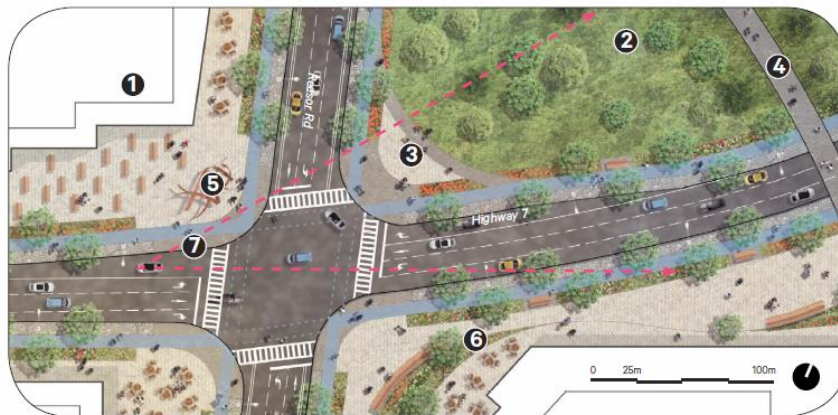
Highway 7 and Reesor Road intersection demonstration plan
